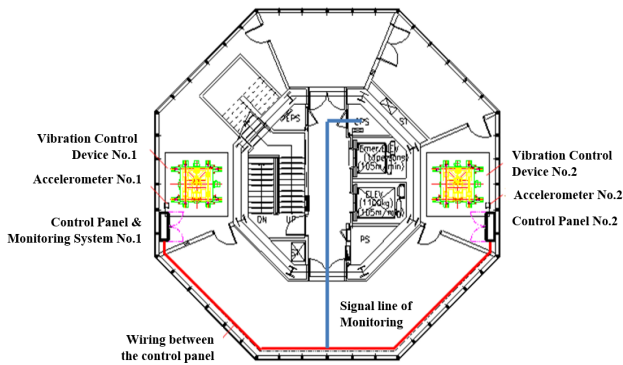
Floor plan of control room(11<sup>th</sup> floor)
